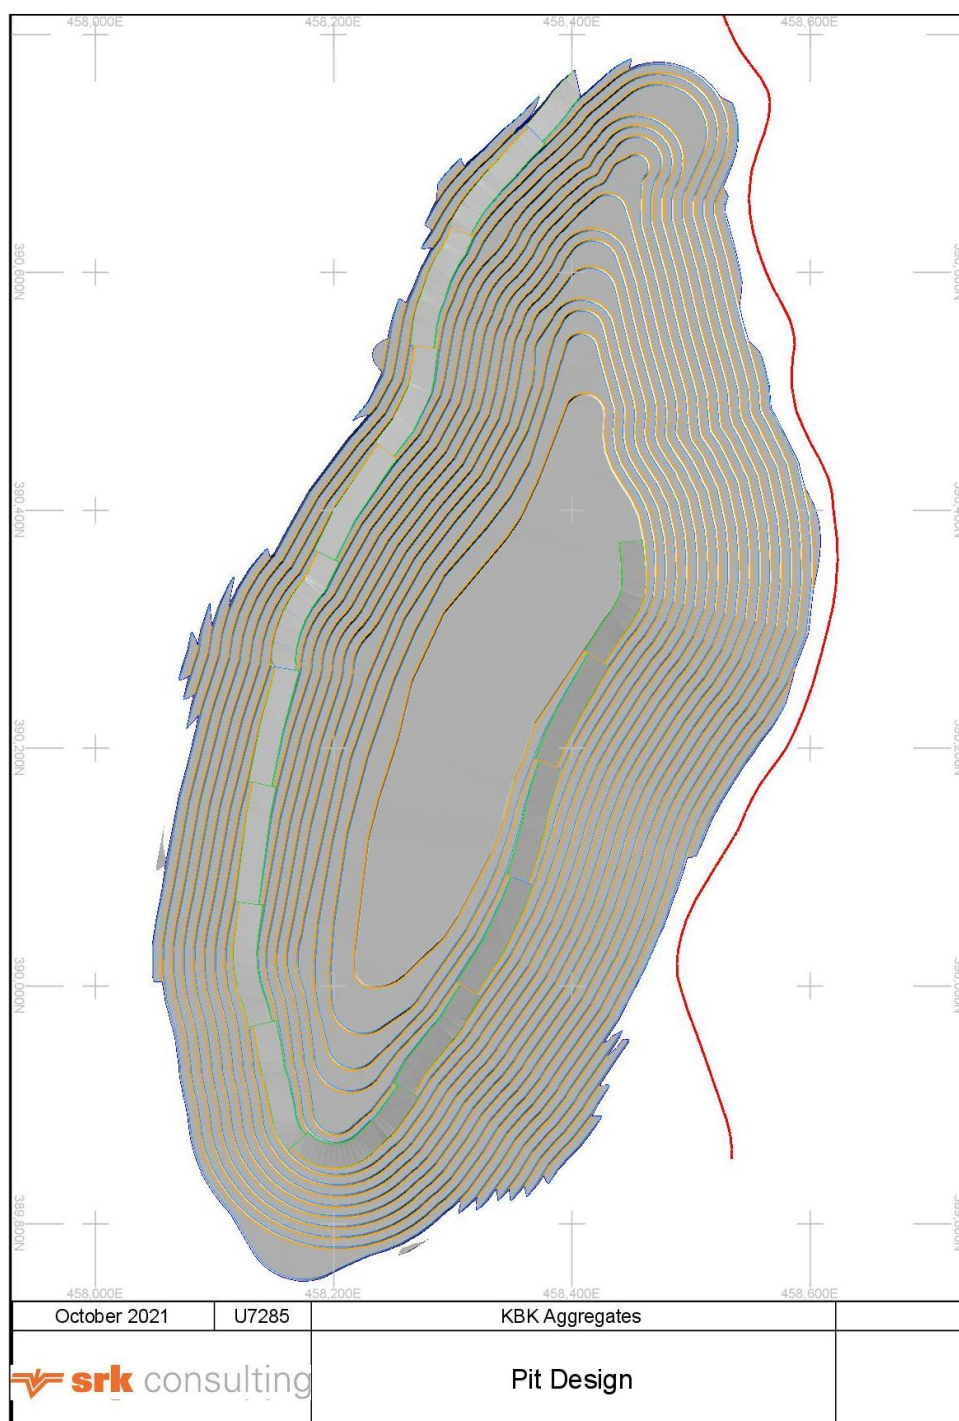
Proposed Pit Design with exit ramp to the north of the permit
